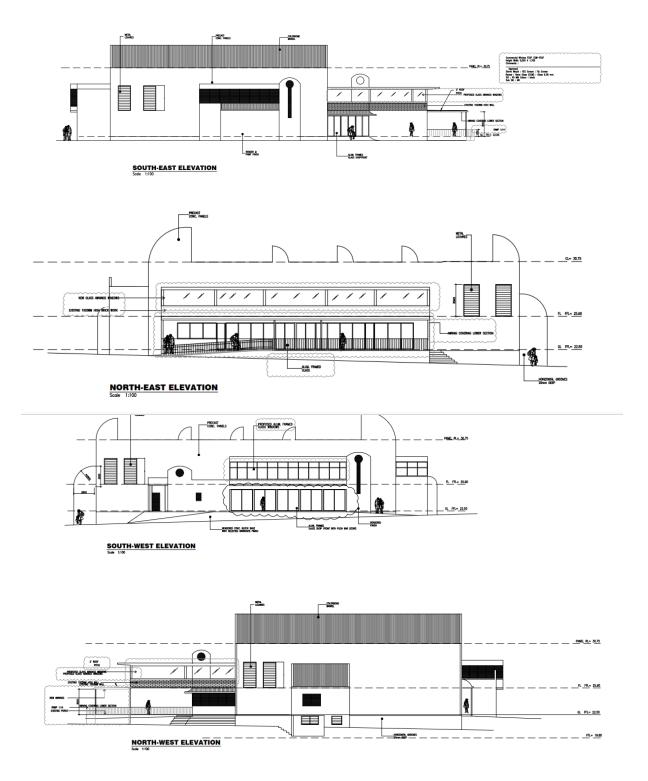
, 7, 8, 9 and 10: Replacement of mesh fly screens with built up brick walls and aluminium framed windows
